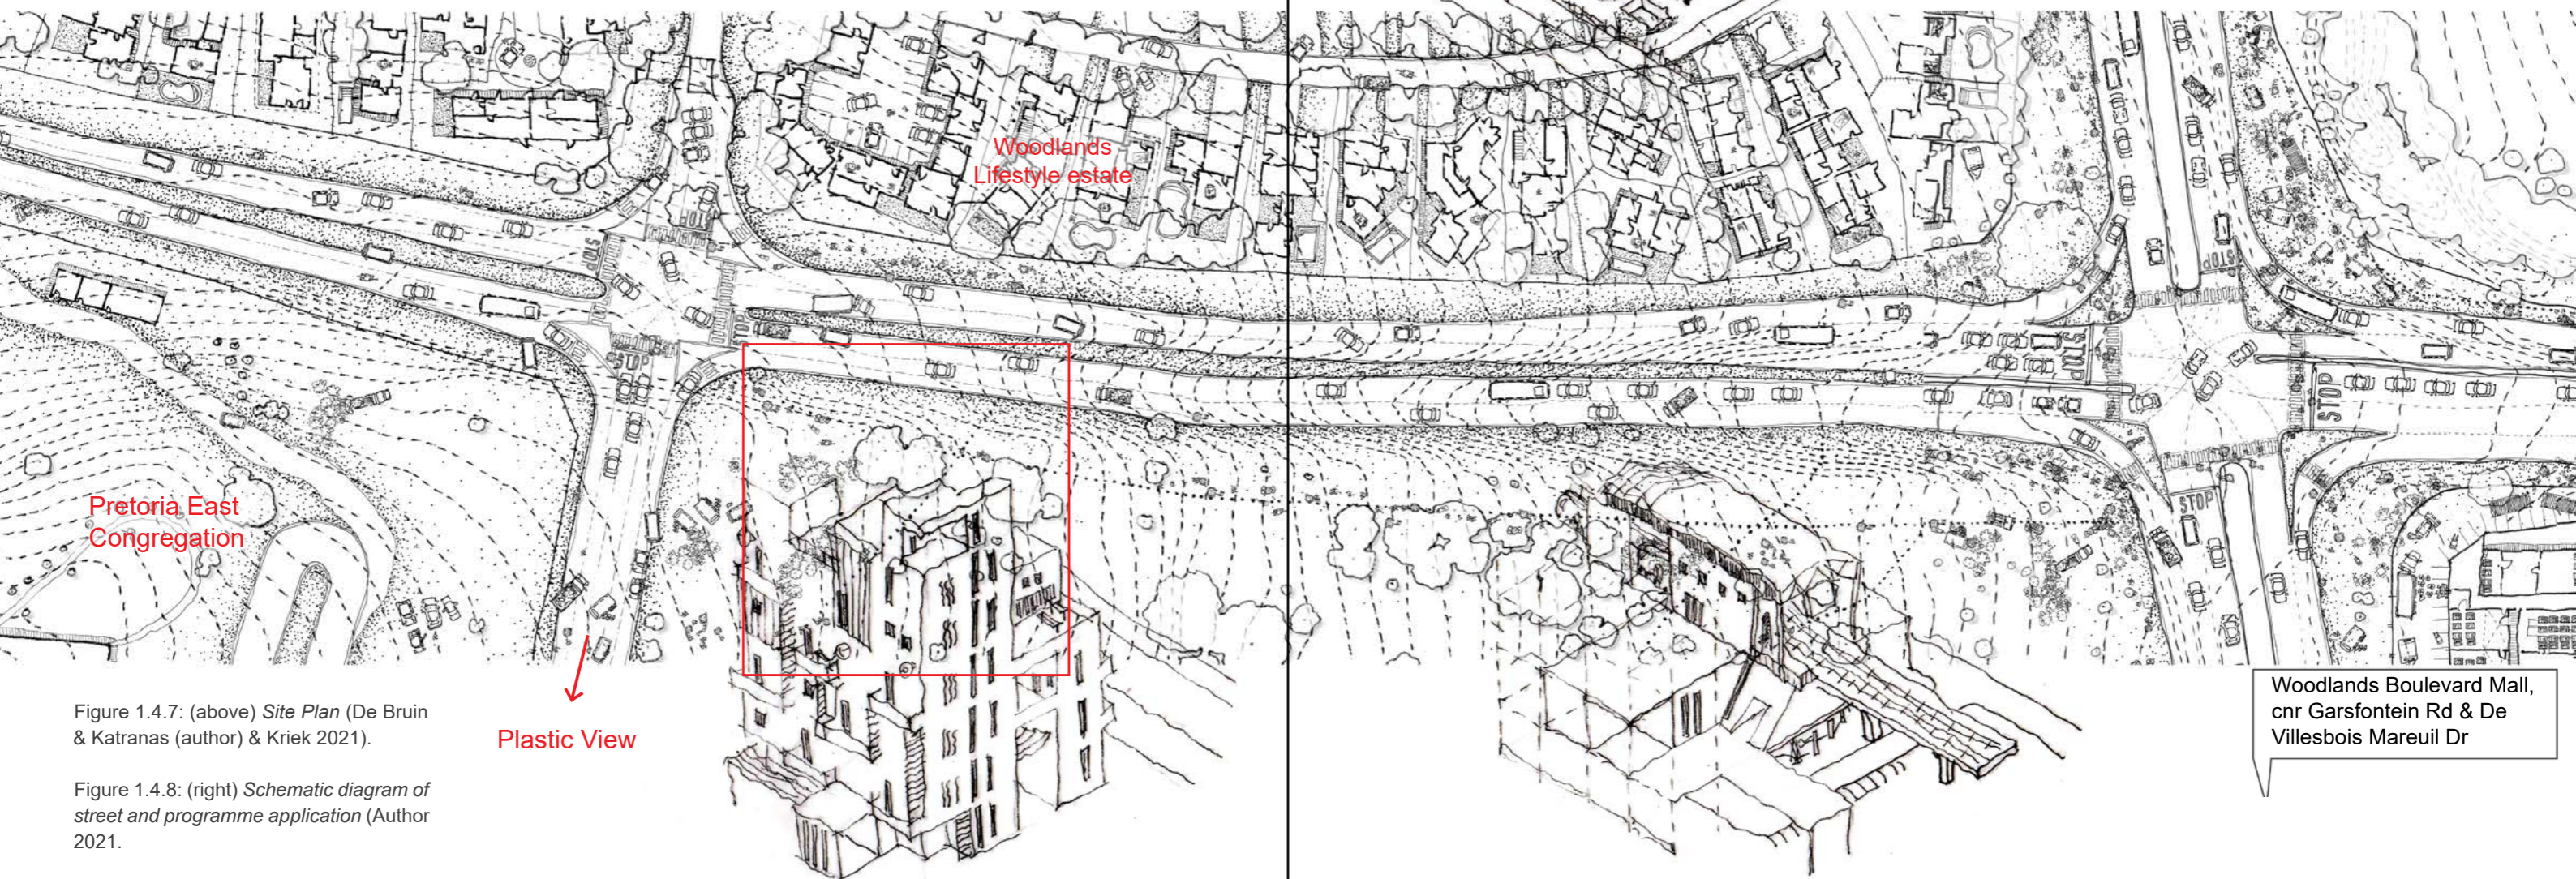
(above) Site Plan (De Bruin & Katranas (author) & Kriek 2021).
